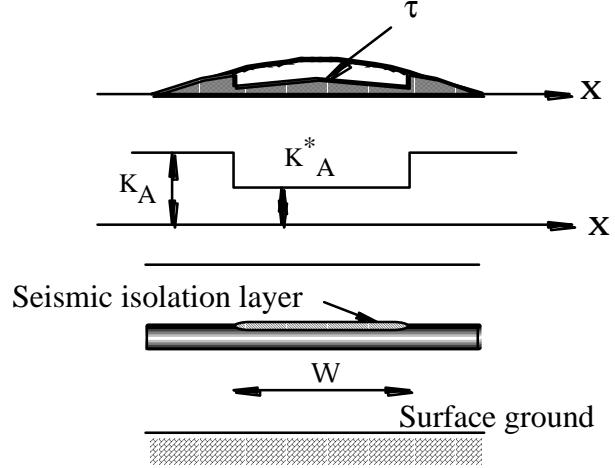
Structural model of shield tunnel and seismic isolation layer.
